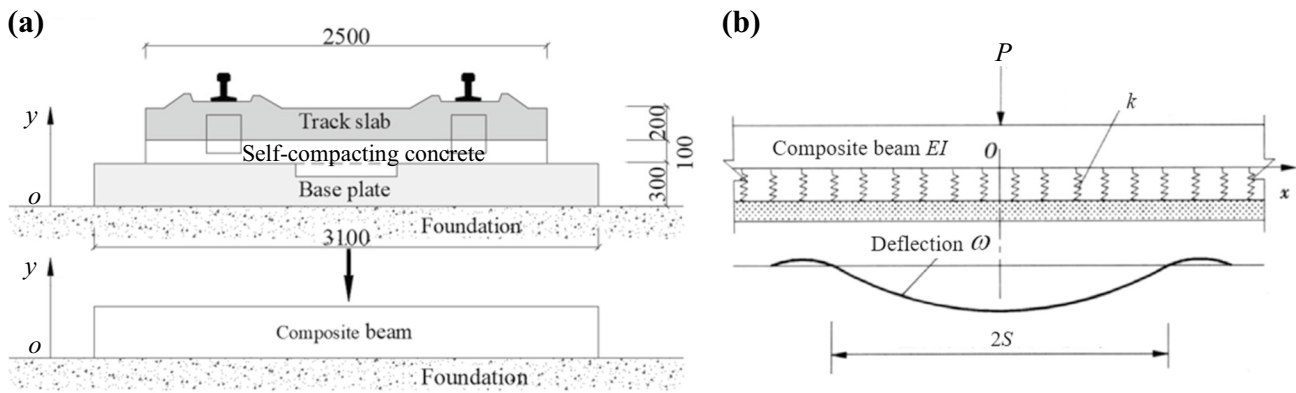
The composite beam model of ballastless tracks (unit: m): a cross section; b longitudinal profile
